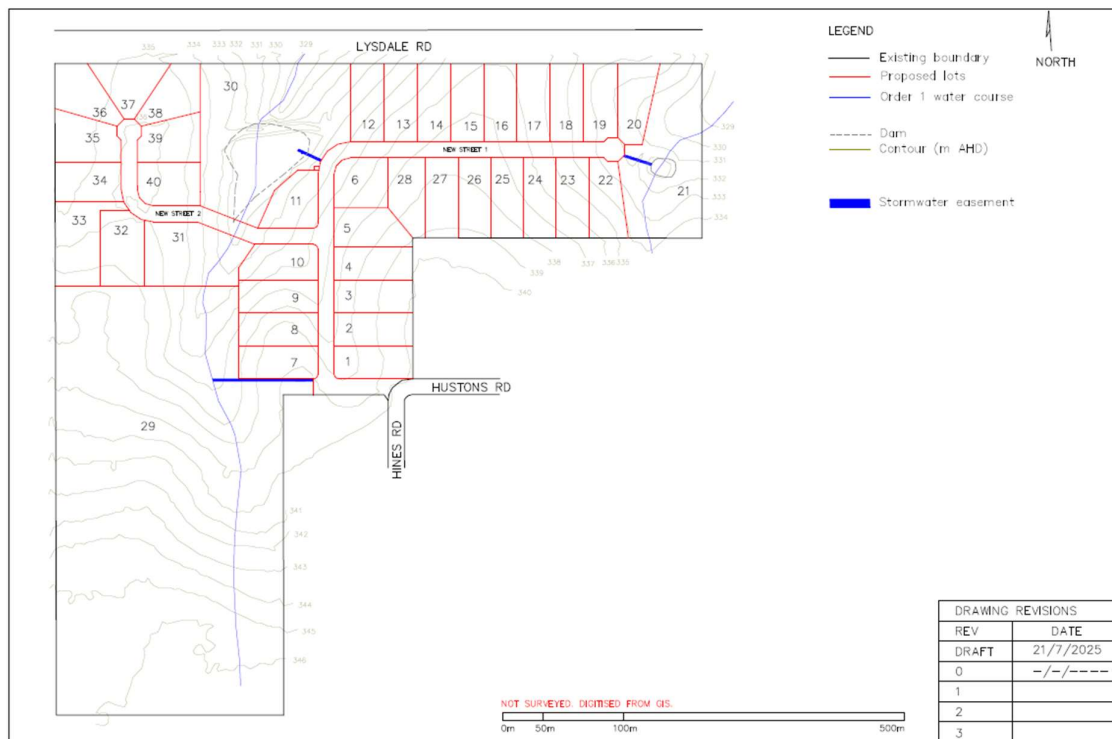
Proposed Subdivision Layout 5A (Stormwater) – Lot 59 SP184725 – Dated 21/7/2025
